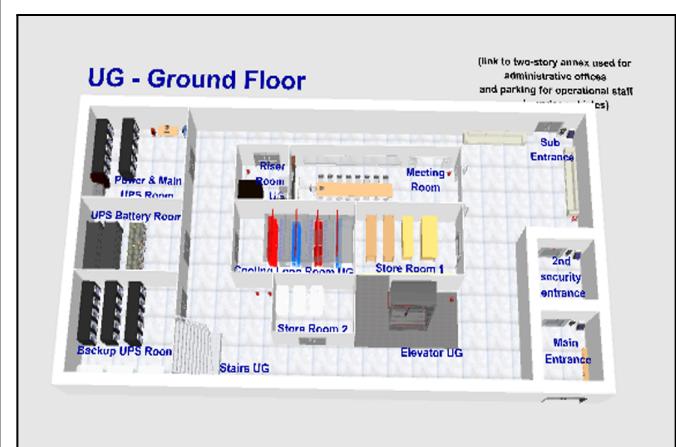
Ground Floor Floor Plan (3D View)
